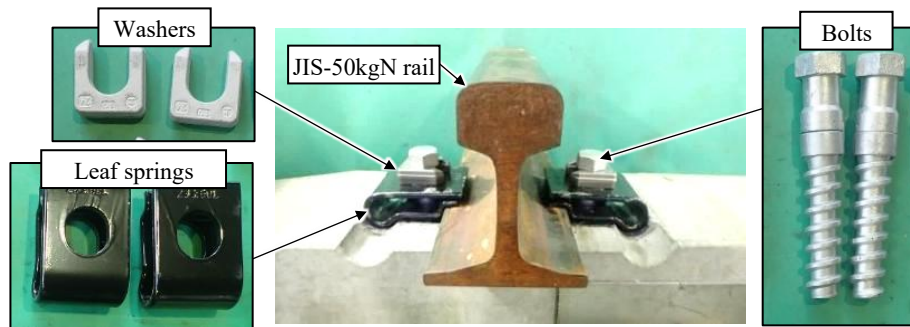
Rail fastening system requiring no bolt retightening developed in a previous study [3].
